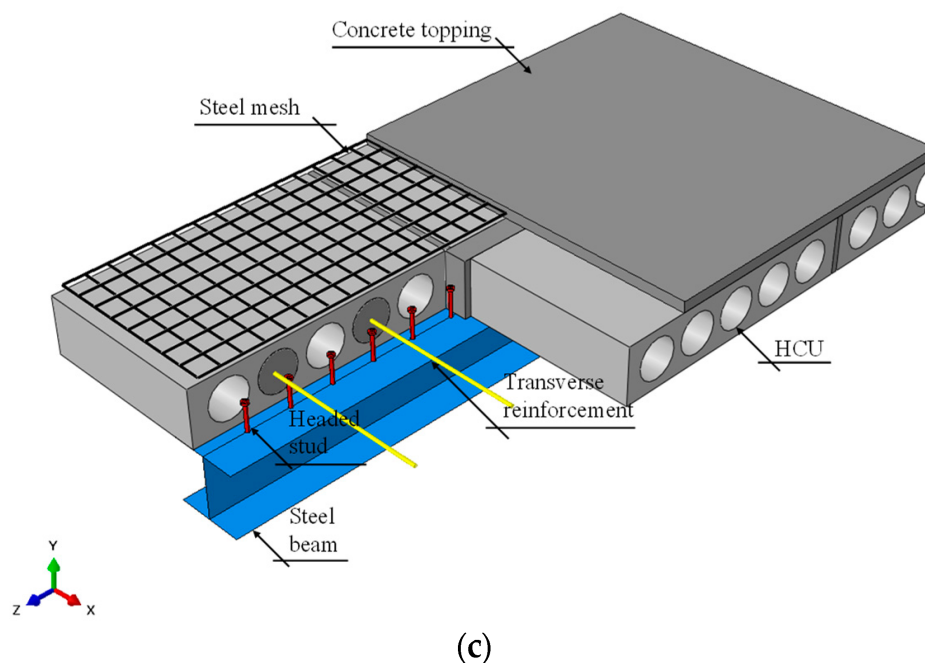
Steel beam to concrete hollow core slab connection [20]
